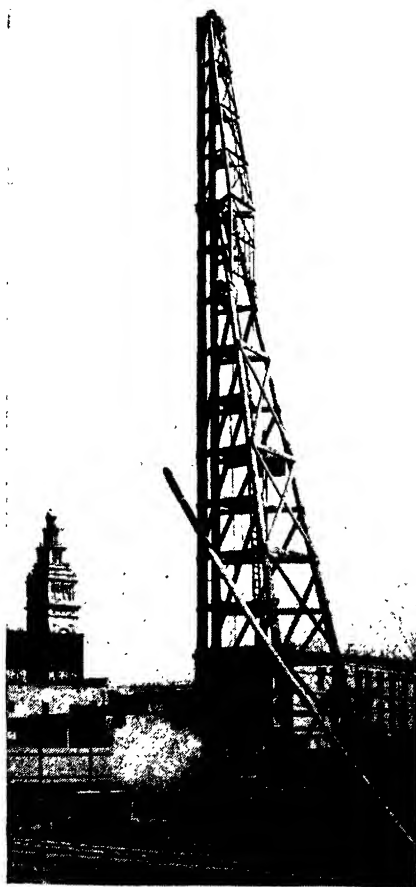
Timber Pile Driver Surmounted with a Steel Frame Extension.
